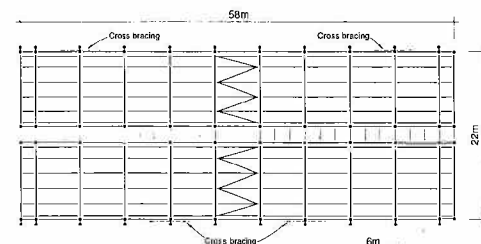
Steel framework plan showing braced H frames and cross bracing on N and S elevations
